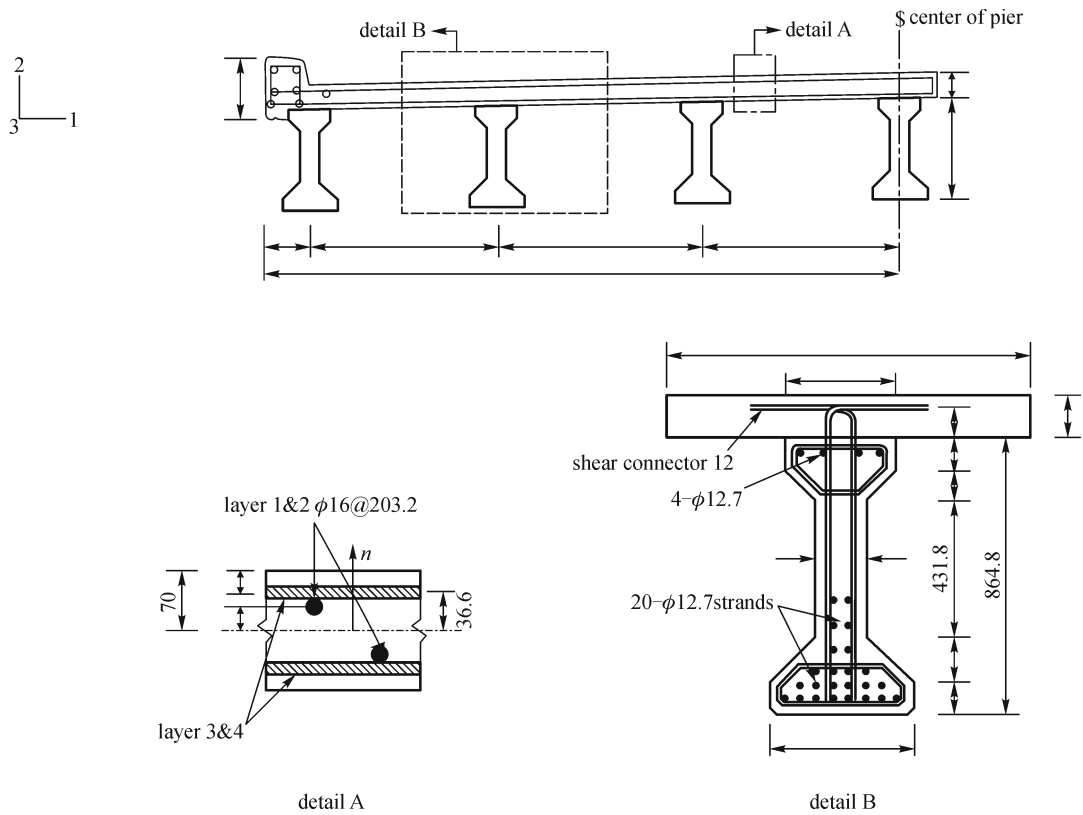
Dimension of the bridge deck and the reinforcement in the middle of span
